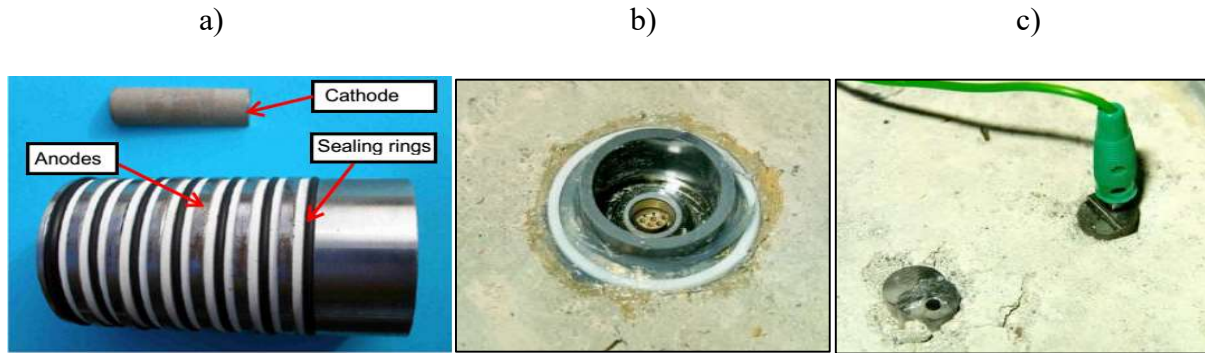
An expansion ring system; prior to installation (a), an expansion ring anode after installation (b) and the cathodes (c) [106,107]
